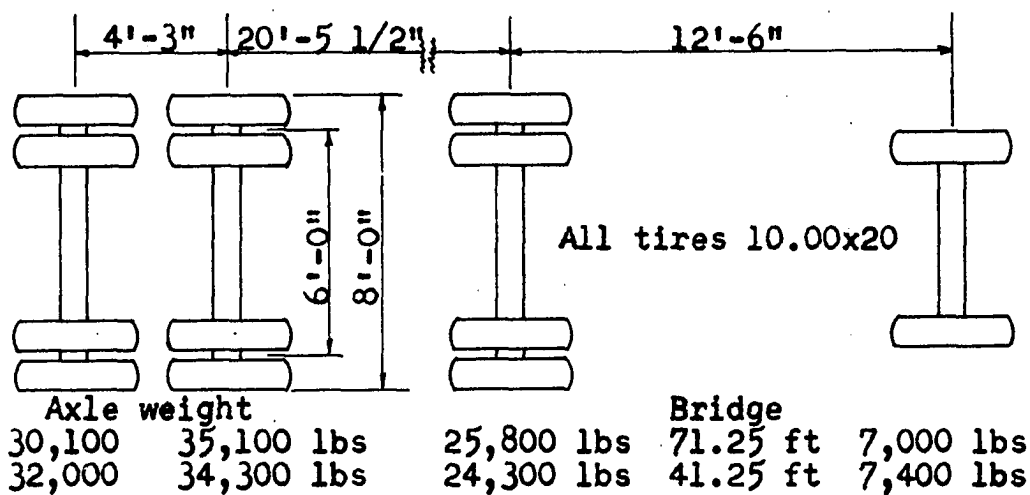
Truck loading used on the 41.25 and 71.25 foot simple span highway bridges in HR-12 Project (Holcomb)
